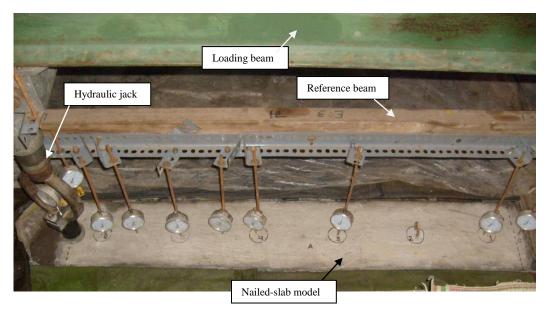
A bird's-eye view of Nailed-slab model with vertical wall barrier on the each end of slab (indicated by dash-line).
